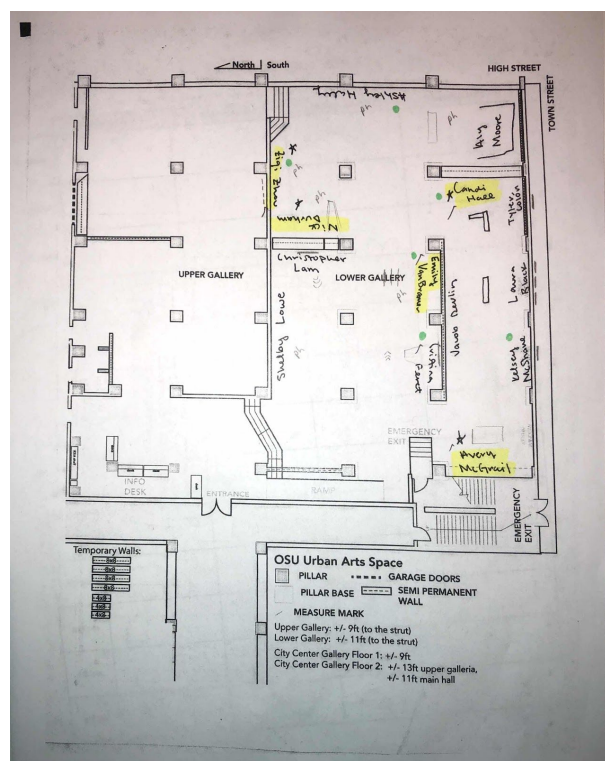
Naomi's proposed floor plan (left). November 9, 2018.
